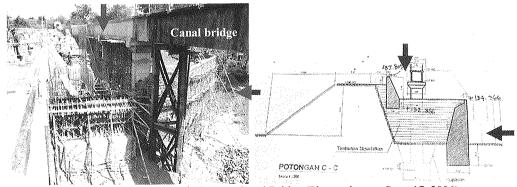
Reconstruction of Mataram Canal Bridge (Photo taken on Sept. 17, 2006)
